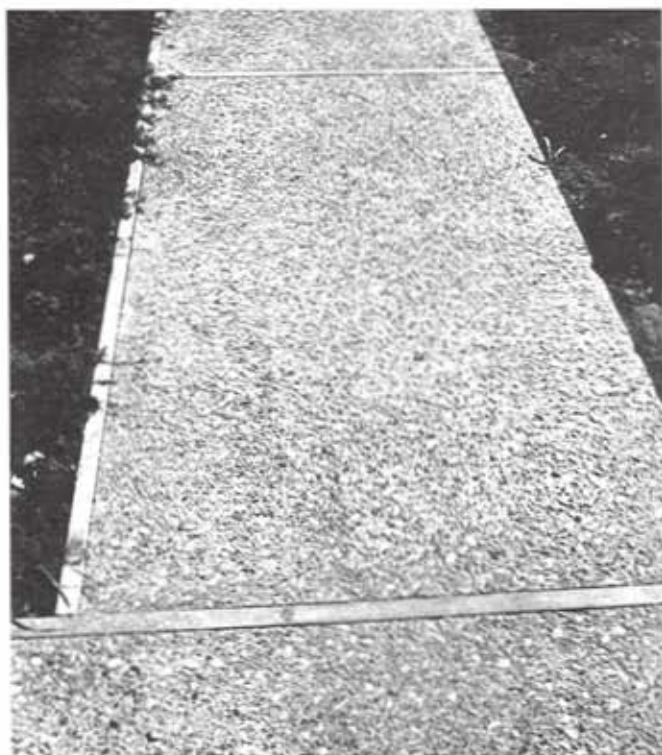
An exposed aggregate concrete sidewalk with wood expansion joints. This type of sidewalk should be built only in a mild climate because repeated freezing and thawing will crush the wood and dislodge some of the exposed aggregate. Besides, snow and ice become harder to remove as the surface texture of any paving material coarsens.
